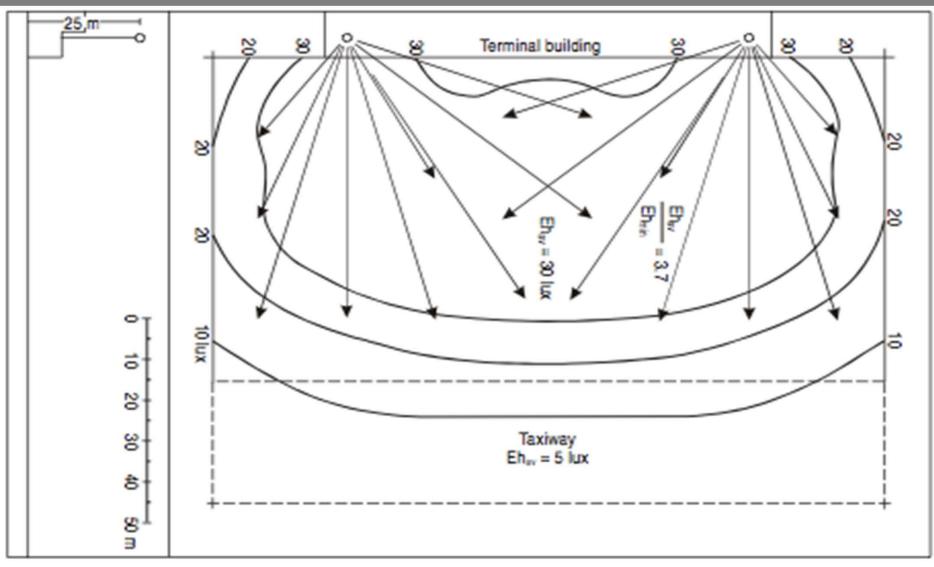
Typical floodlight arrangement and aiming for nose-in parking
